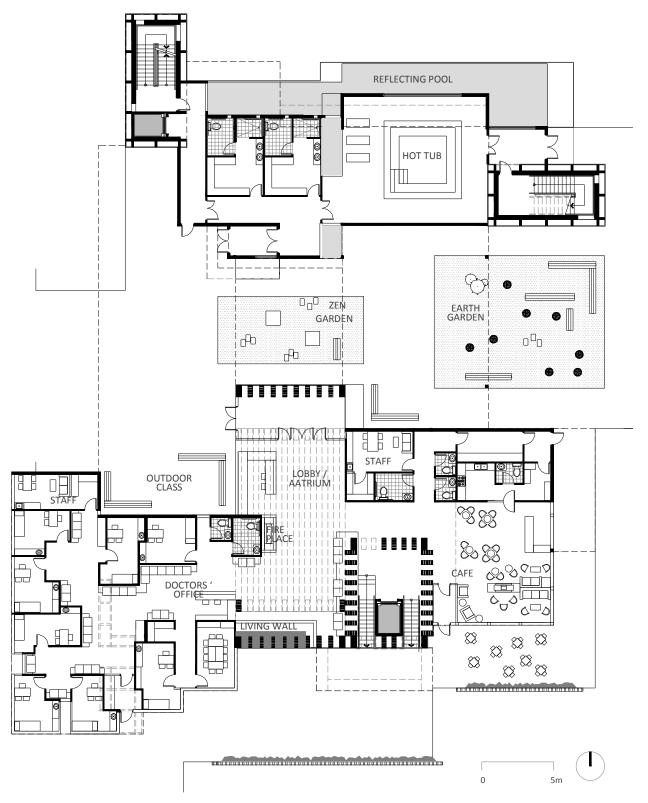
First Floor Plan – Showing: Hot Tub (Water Element); Doctor's Office, Café, and Living Wall (Wood); Lobby / Atrium, and Fireplace (Fire)
